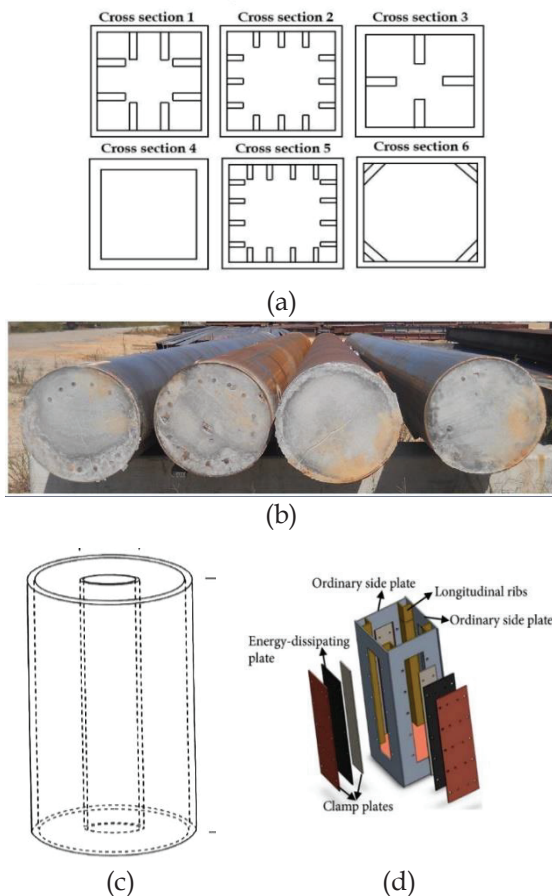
Improvement Methods for Steel Piers: (a) different Stiffener Arrangements (b) Concrete Filling (c) Double Column Arrangement and (d) Energy Dissipation Methods
